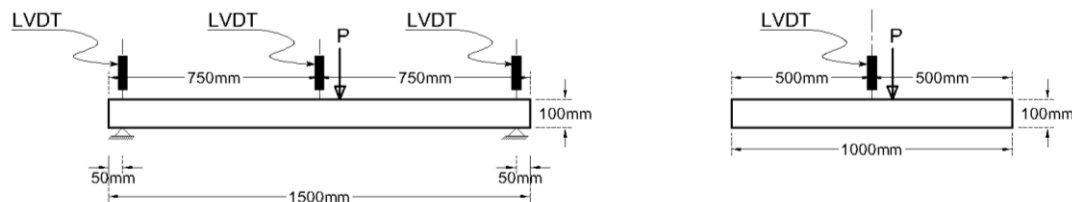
a Typical Section Showing Load, and LVDTs Locations
